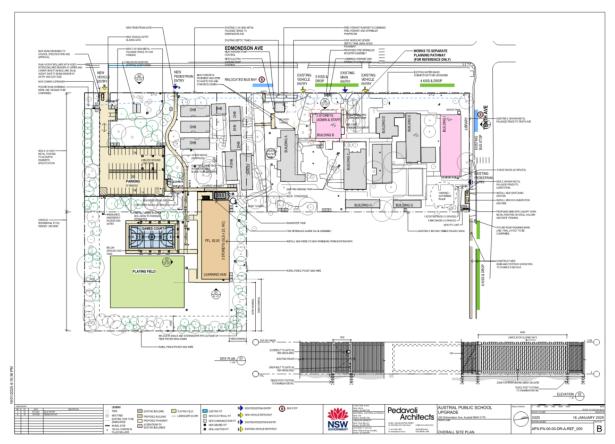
Proposed Site Plan (Source: Pedavoli Architects, Overall Site Plan (Rev B).
